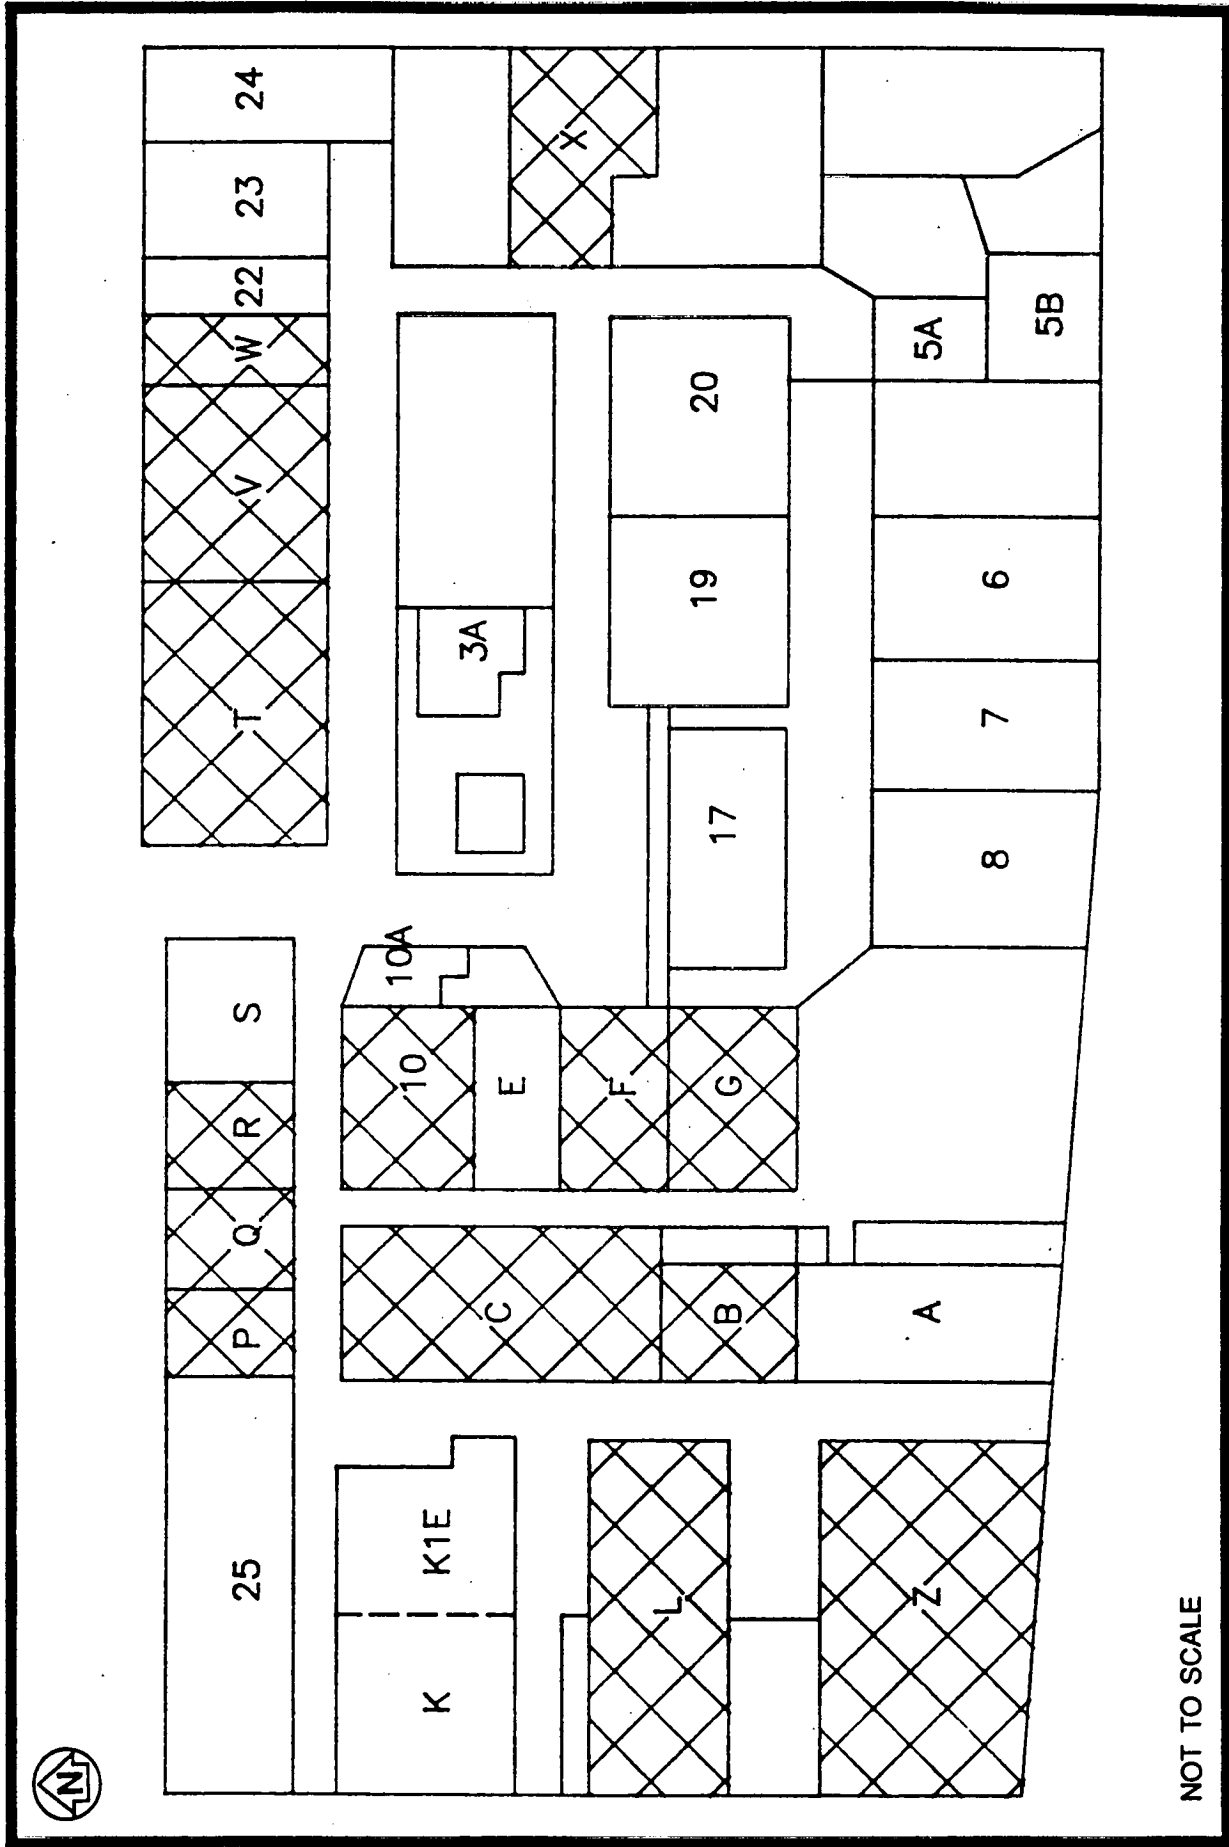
LOCATIONS OF ADDITIONAL ROOF SURVEYS AT PLANT 1
